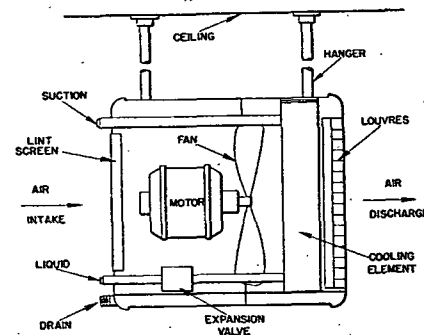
SUSPENDED PROPELLER FAN TYPE UNIT AIR CONDITIONER
